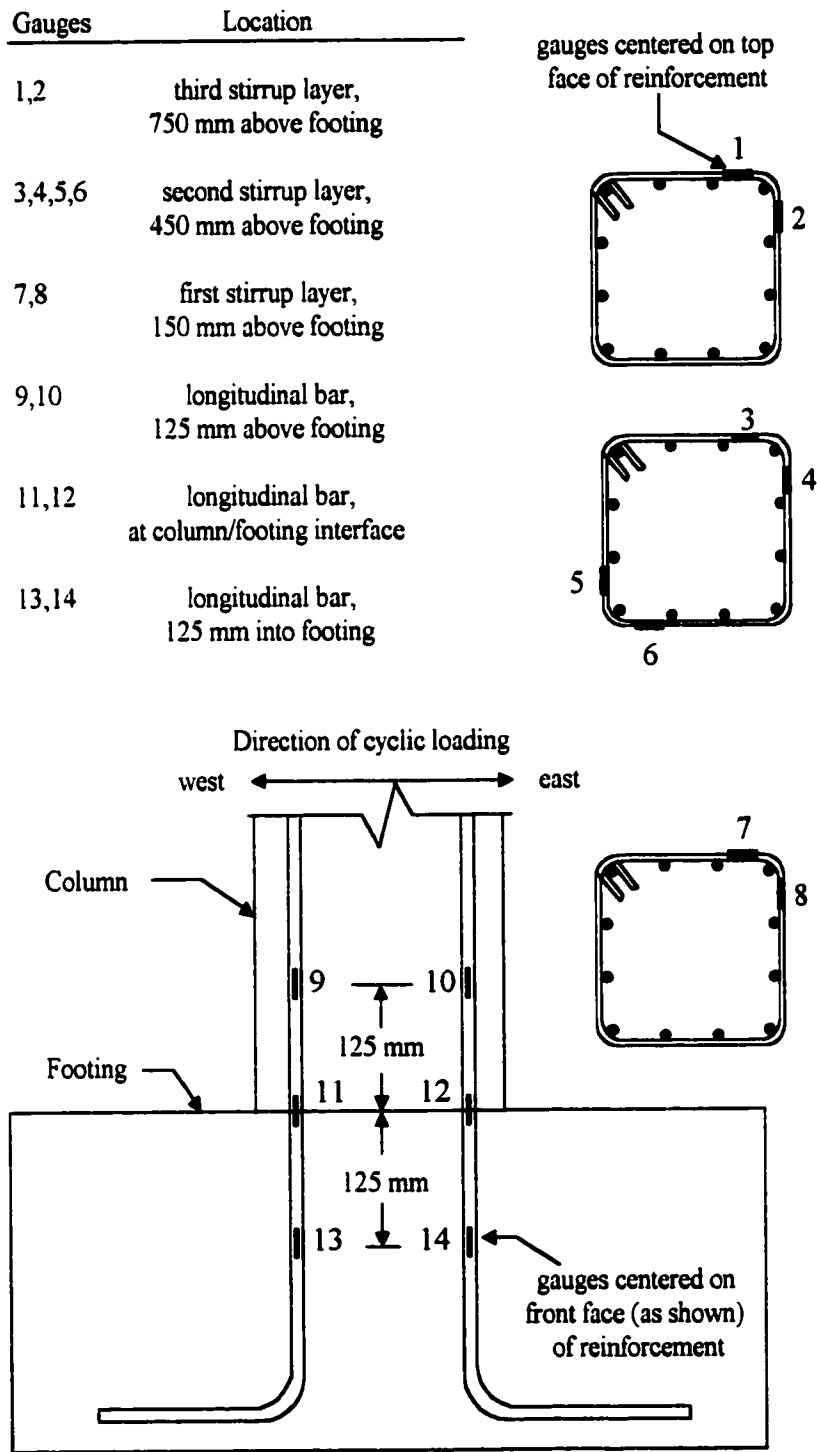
Strain gauge location on reinforcing steel for columns BR-S3 and BR-S4
